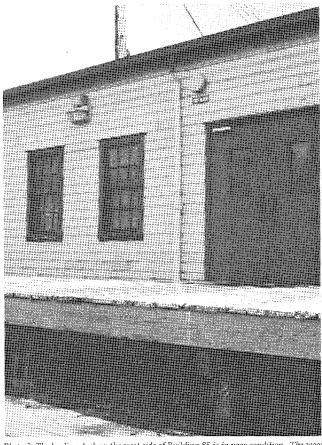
The loading dock on the west side of Building 85 is in poor condition. The wood siding, trim and doors require repainting.
